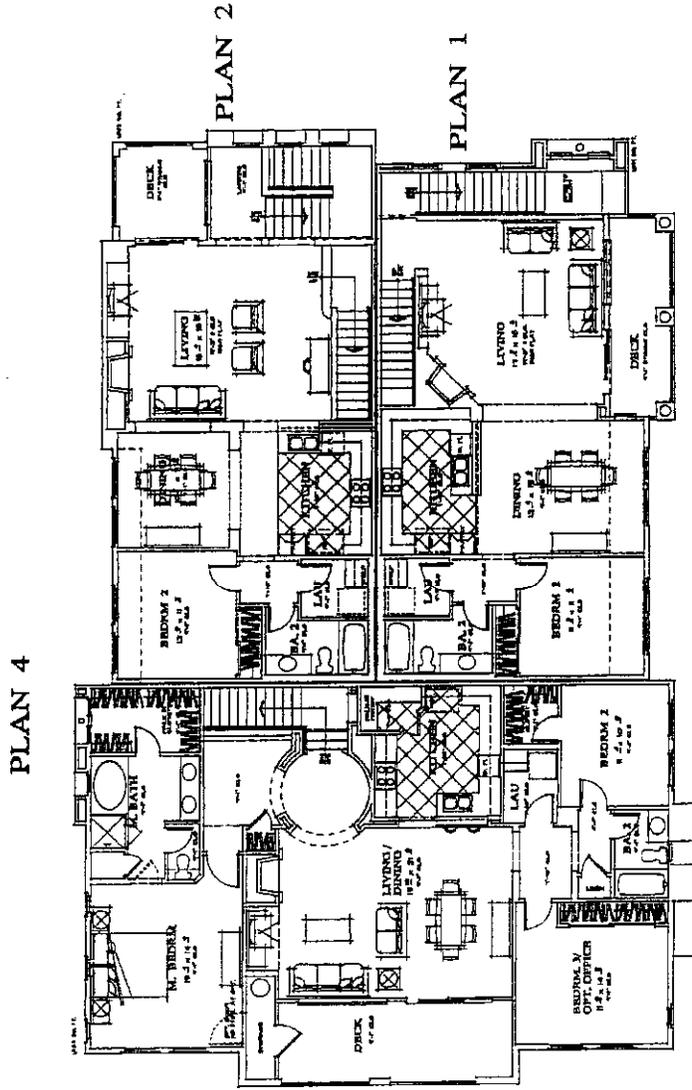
K – Arborelle – Building A – Floor Plans and Elevations
